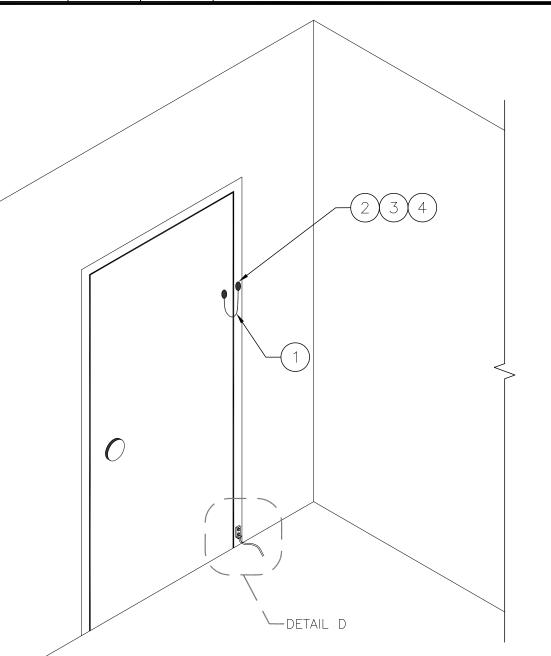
GROUNDING CONNECTION TO FIVED METALLIC RENCH
